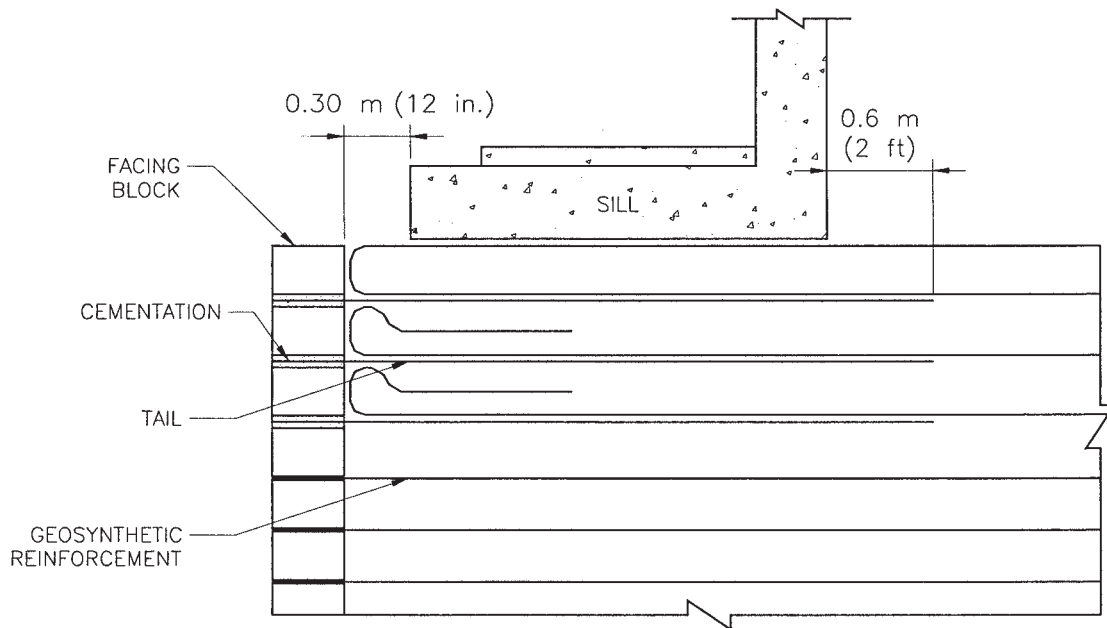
Details of reinforcement layout near the top of the load-bearing wall.
